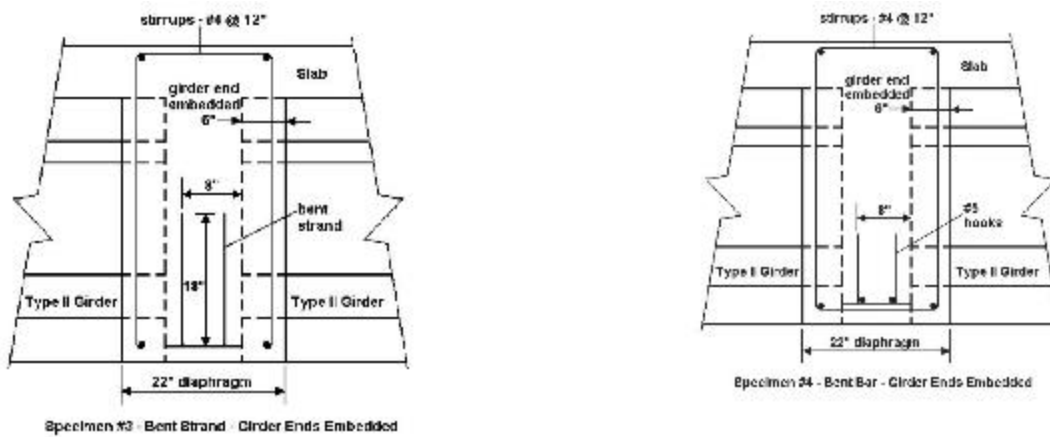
Details of the specimen #3 and # 4 connection (Miller 2004)
